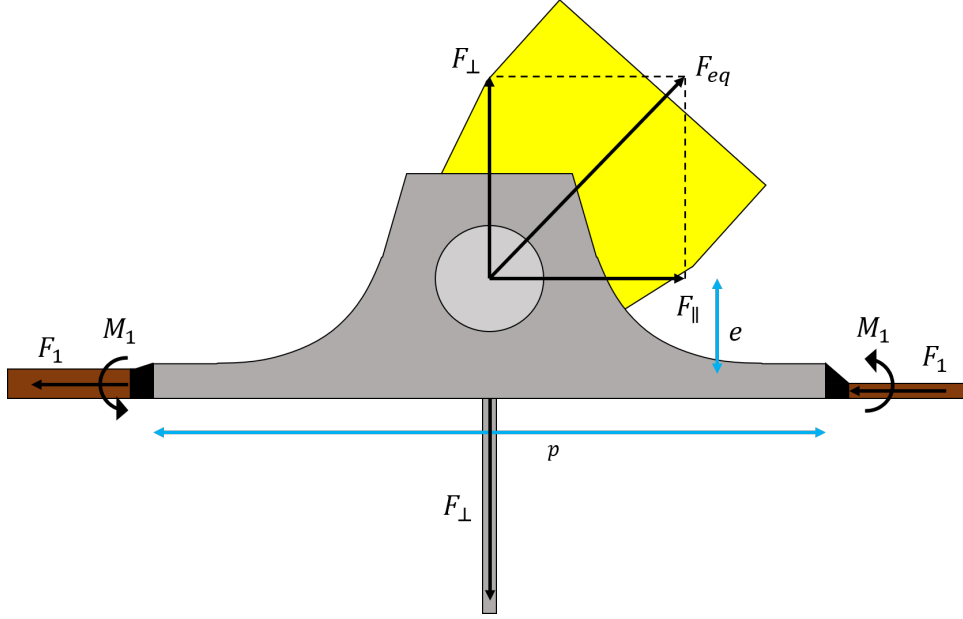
Free body diagram of the casting that is welded in the radial member
